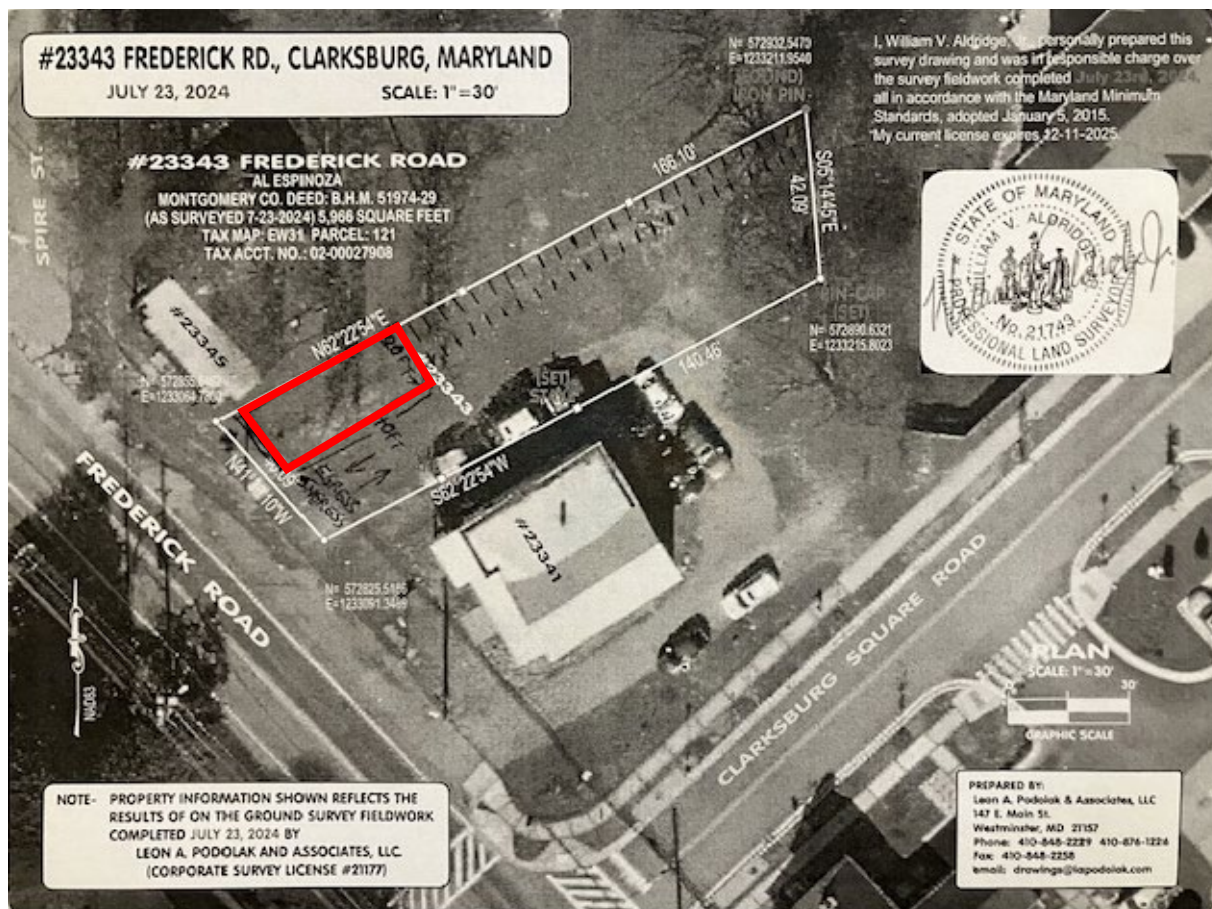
The proposed schematic site plan with the new building outlined in red. The lot is shown outlined in white.
